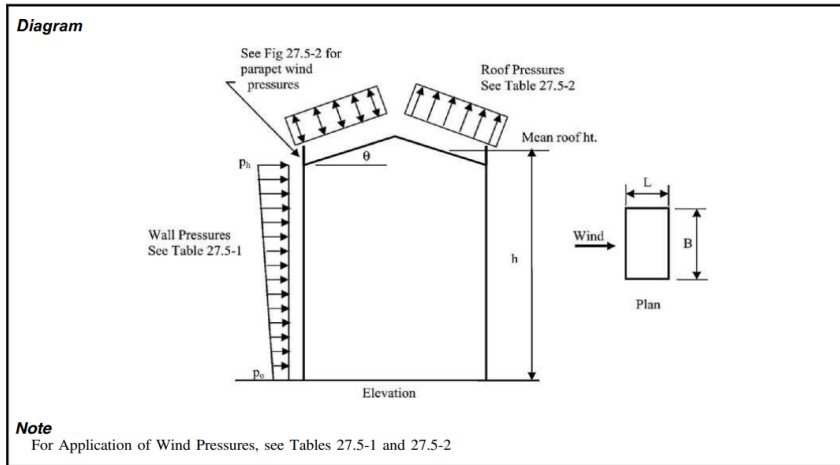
Main Wind Force Resisting System, Part 2 [$h \leq 160$ ft ($h \leq 48.8$ m)]: Enclosed Simple Diaphragm Buildings, Wind Pressures, Walls and Roof
